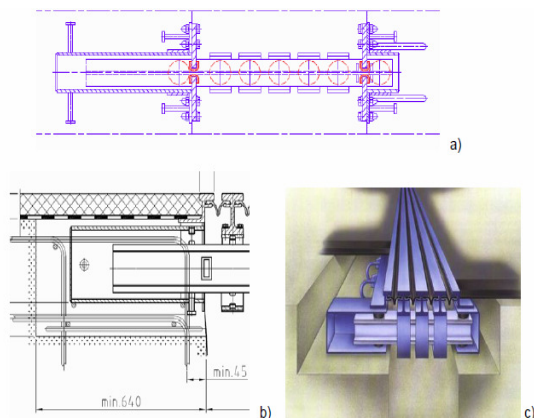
Modular expansion joint with movable mechanism within one cross beam - Manufacturer 2
